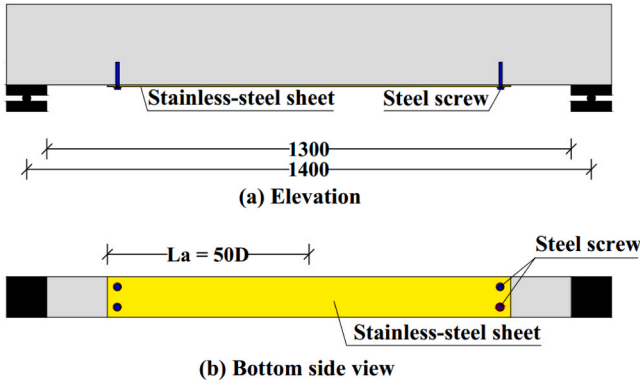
Beams strengthened by stainless-steel sheets bonded with epoxy adhesive and steel screws. (Units: mm).
